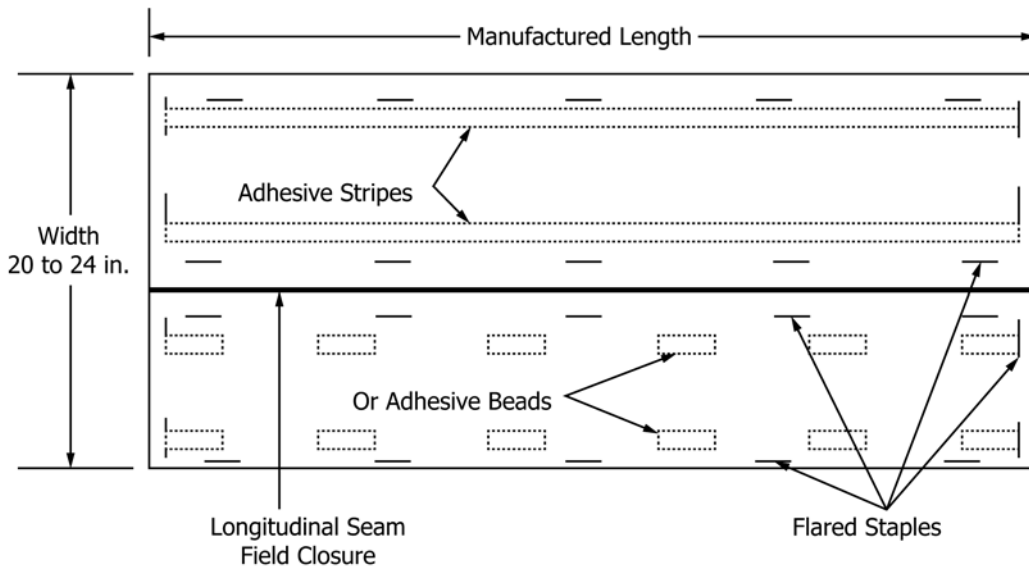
Insulation and Jacket with Longitudinal Adhesive Stripes or Beads (see 6.1.3.1 and 6.1.5.1)
